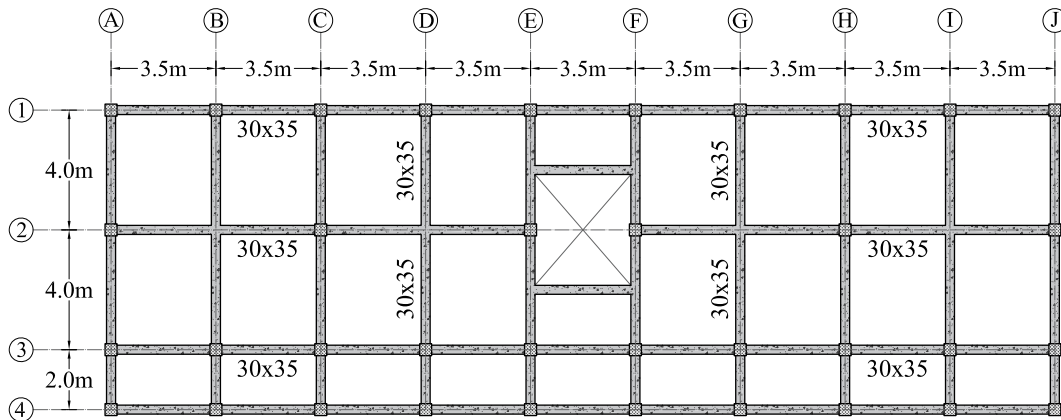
Plan view of the developed archetype school building. Section dimensions are in cm.
